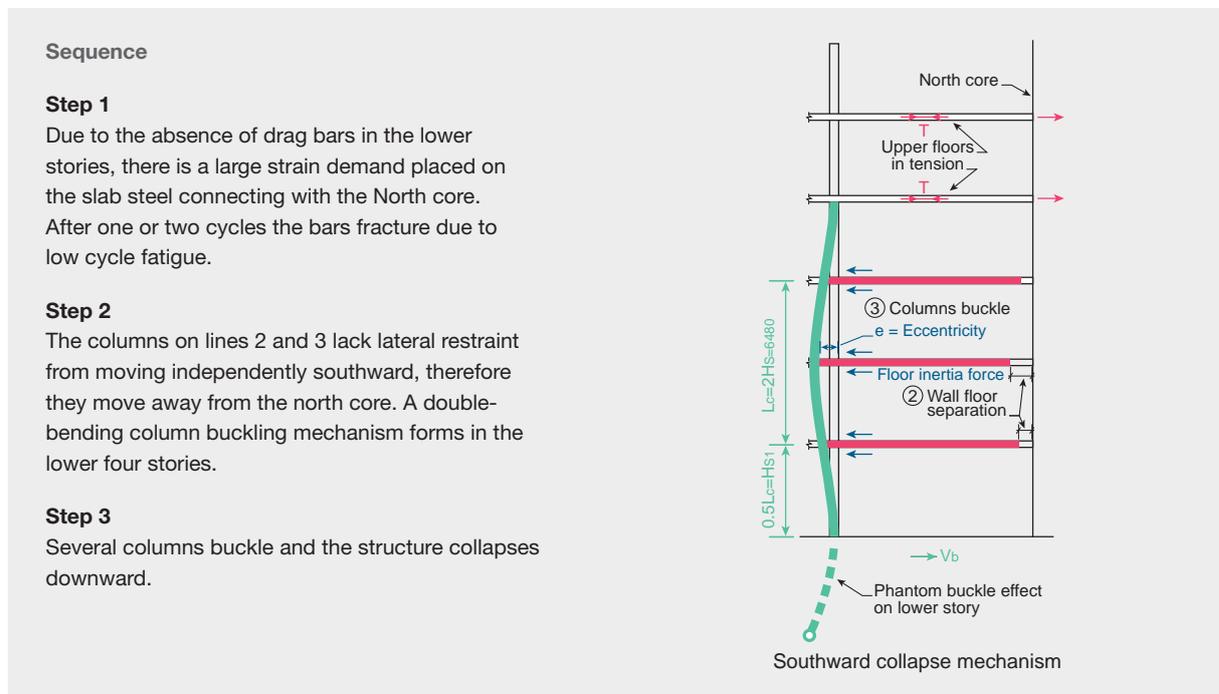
Professor Mander's possible collapse mode diagram for north-south shaking, southward mechanism
